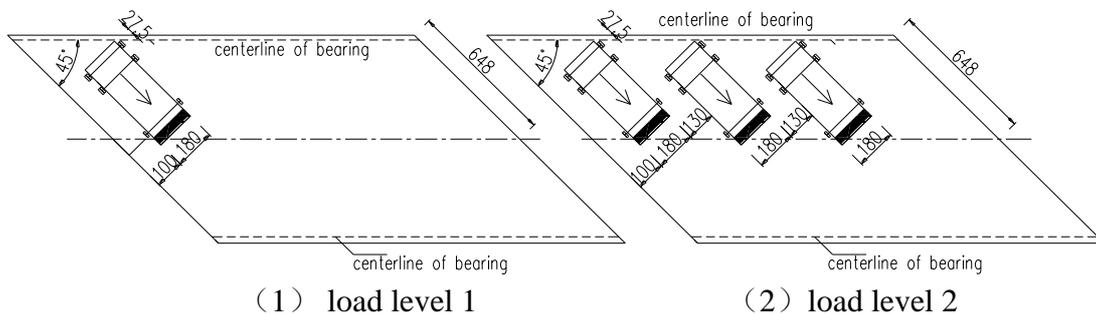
Loading position of shear force near the bearing (Dimension unit: cm)
